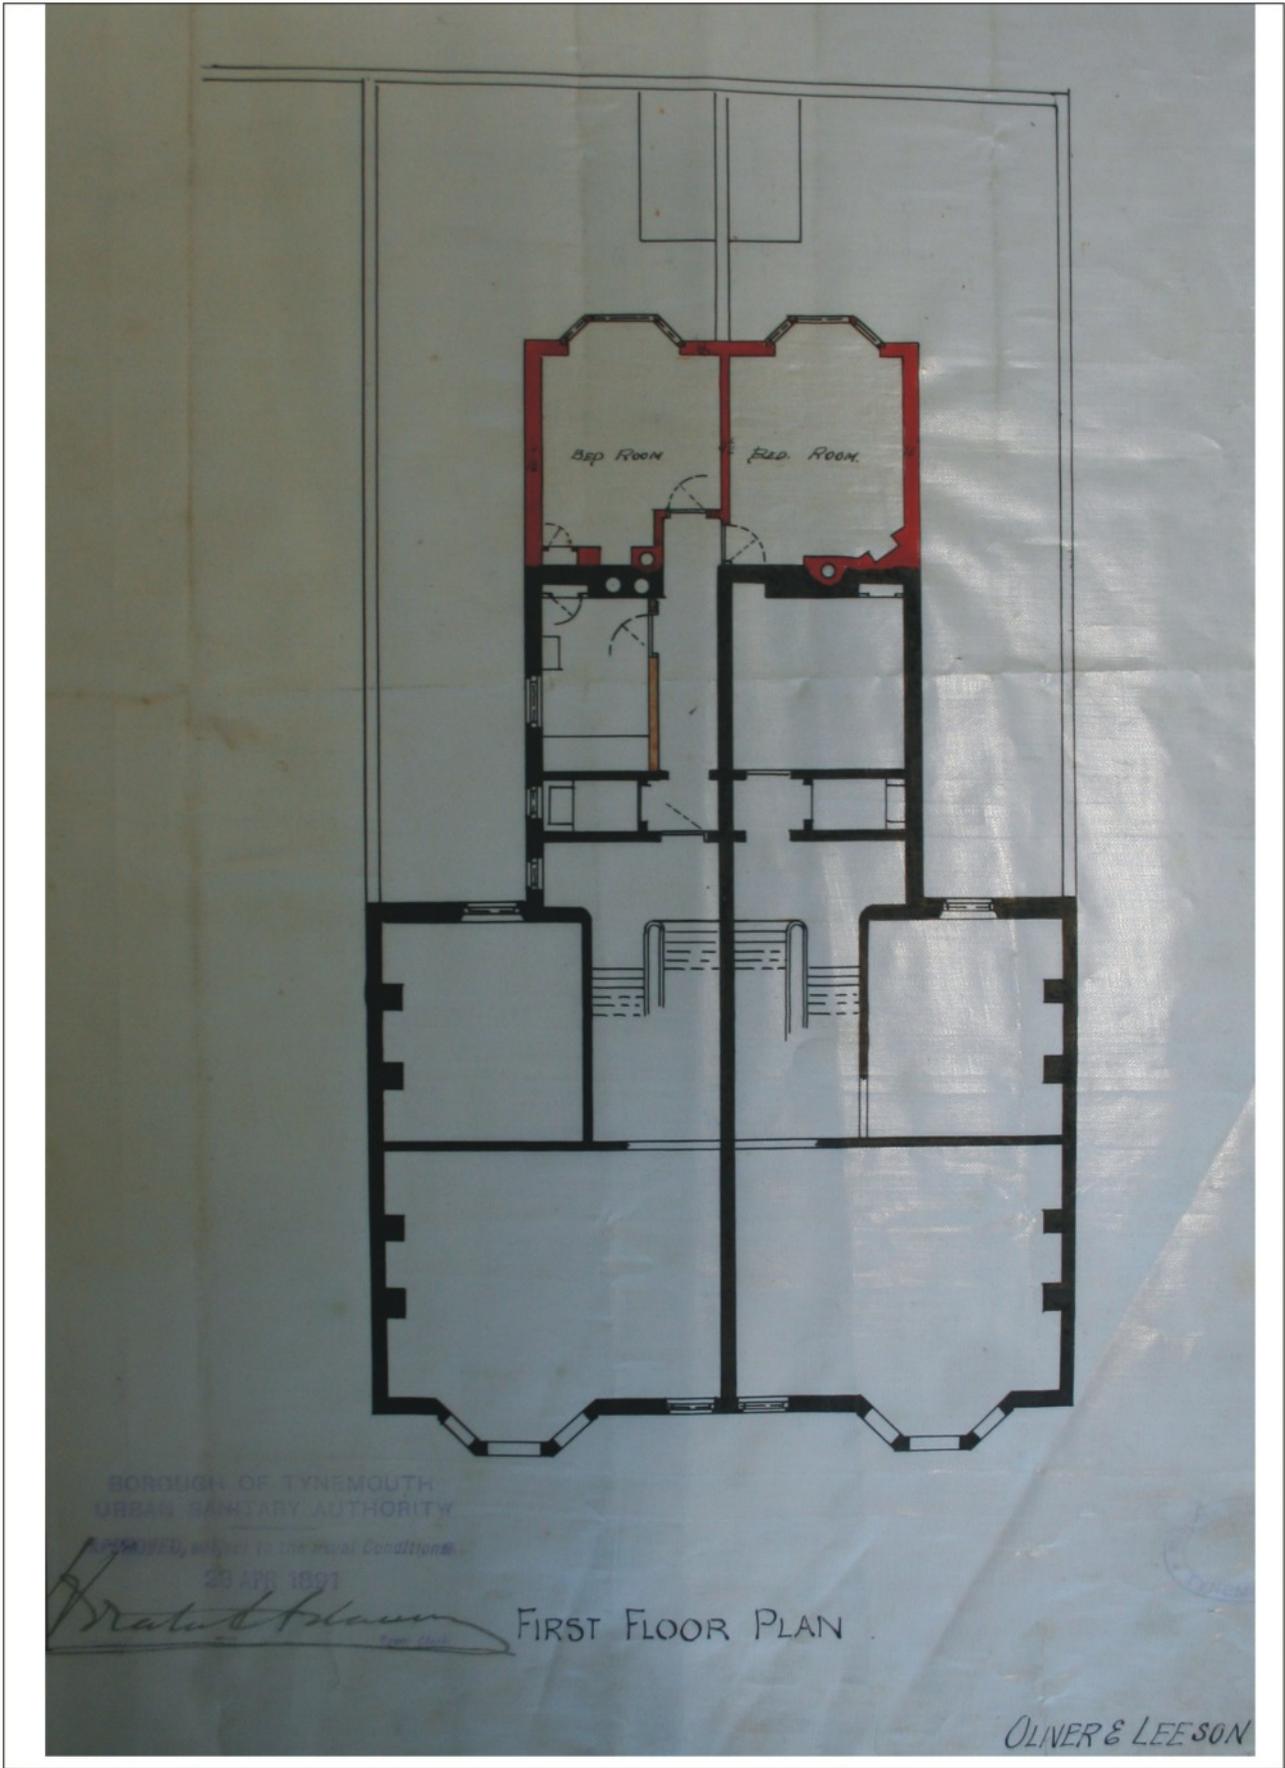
Leeson's 1891 alterations plan of 56-57 Beverley Terrace, first floor.
